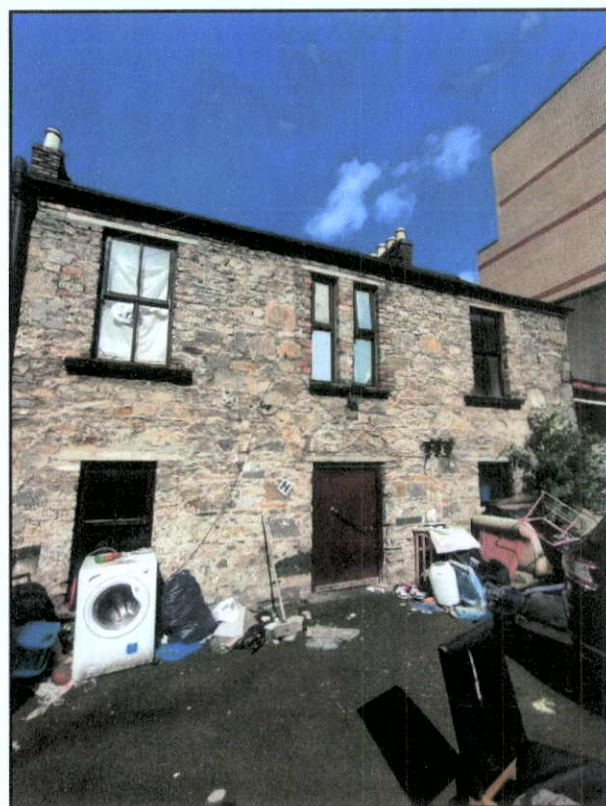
Rear of the house; note concrete lintels and brick window surrounds.
